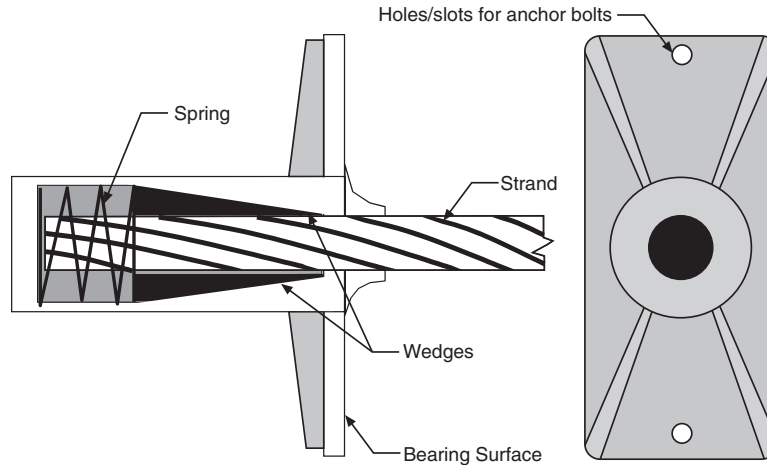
Spring-loaded post-tensioning anchor for precast pavements
